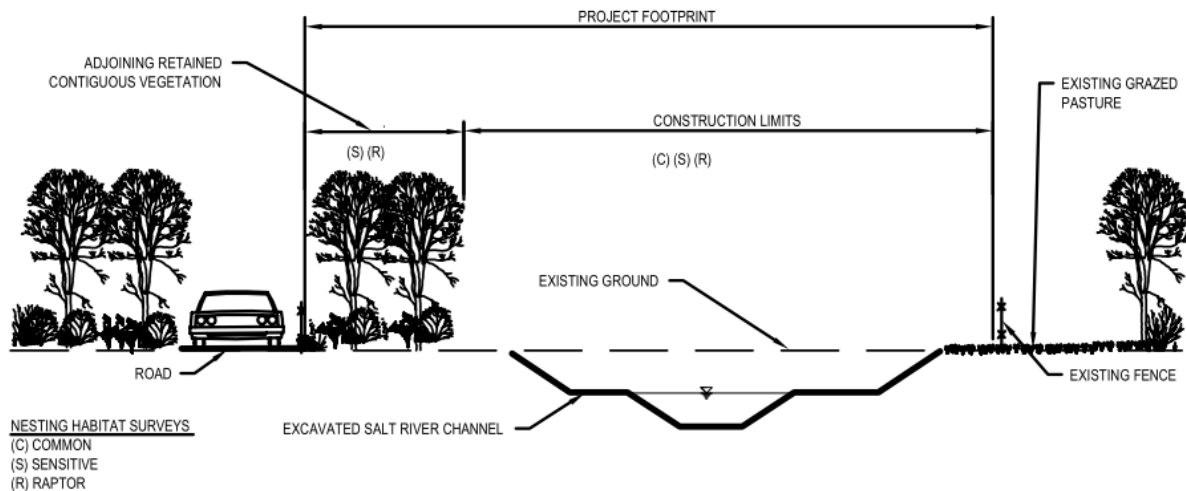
Typical cross-sectional depiction of the Phase 2 project footprint with proposed nesting surveys in construction limits and adjoining retained contiguous vegetation.
